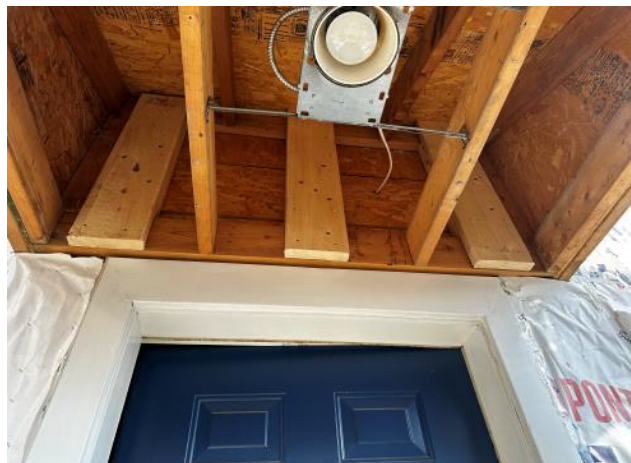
Overview of an entrance roof being reinforced with structural screws in order to eliminate the front brackets.
